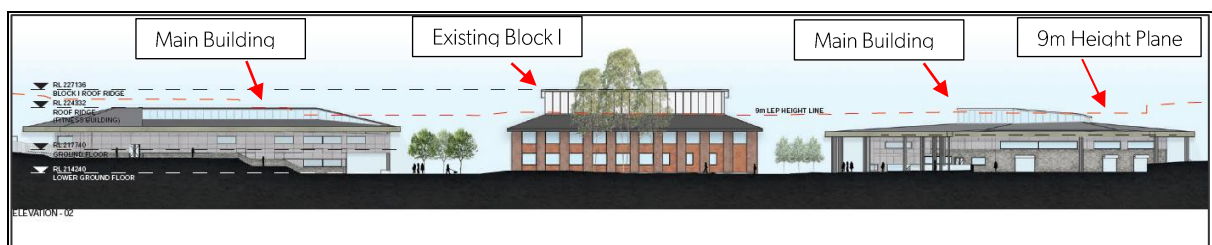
| North elevation – building height plane (source: EIS 2018)
